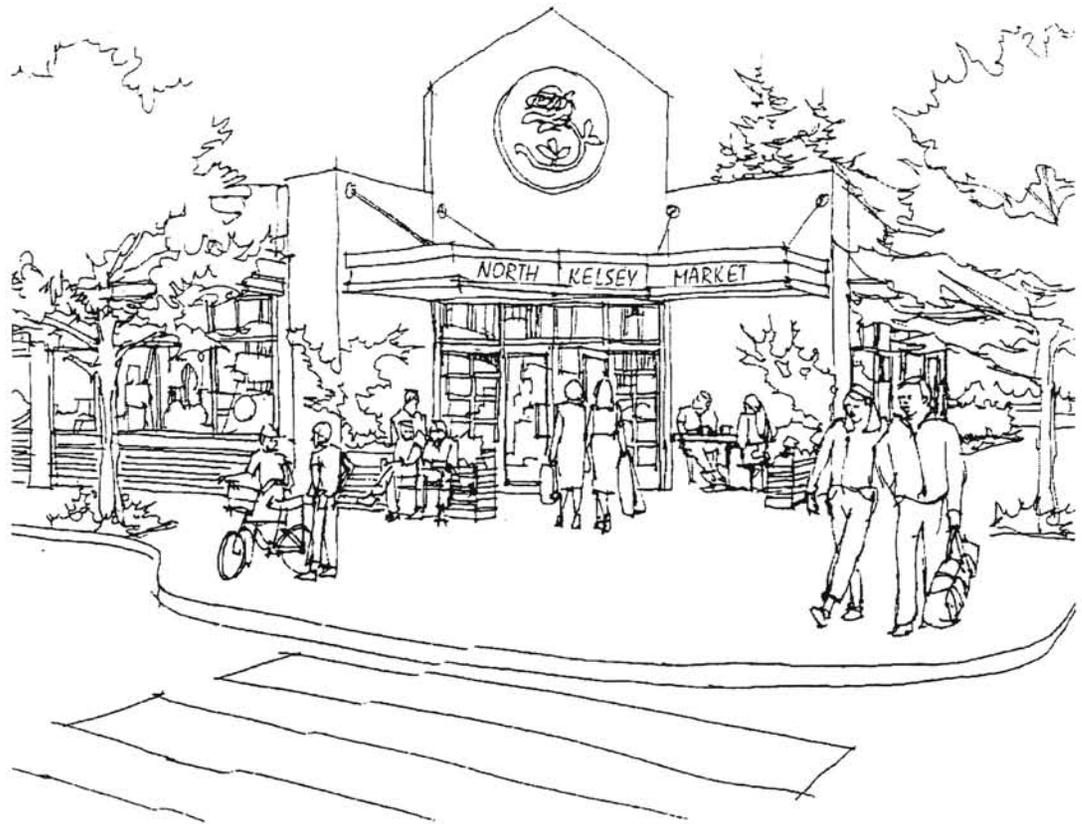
Street corner example: This building celebrates its corner location by including a corner entry, pedestrian space, weather protection, parapet, and special signage.
